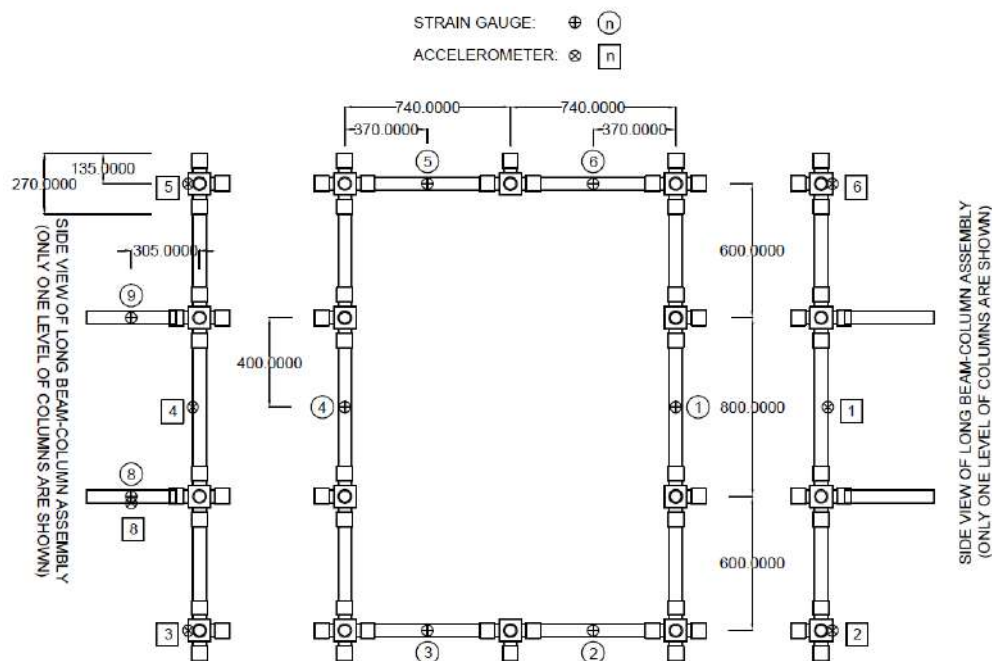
Plan of structural frame with the location of sensors (all dimensions are in mm)
